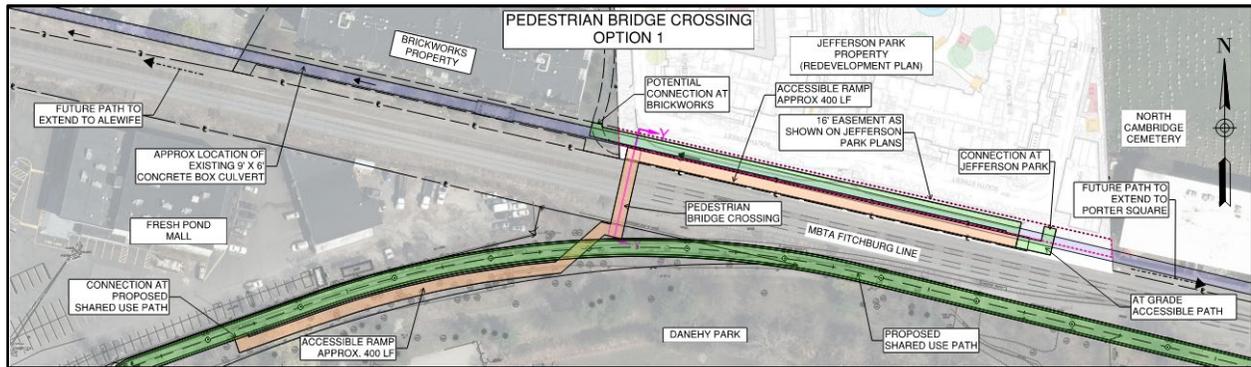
Pedestrian & Bicycle Bridge Crossing Concept 1 – Plan Diagram
